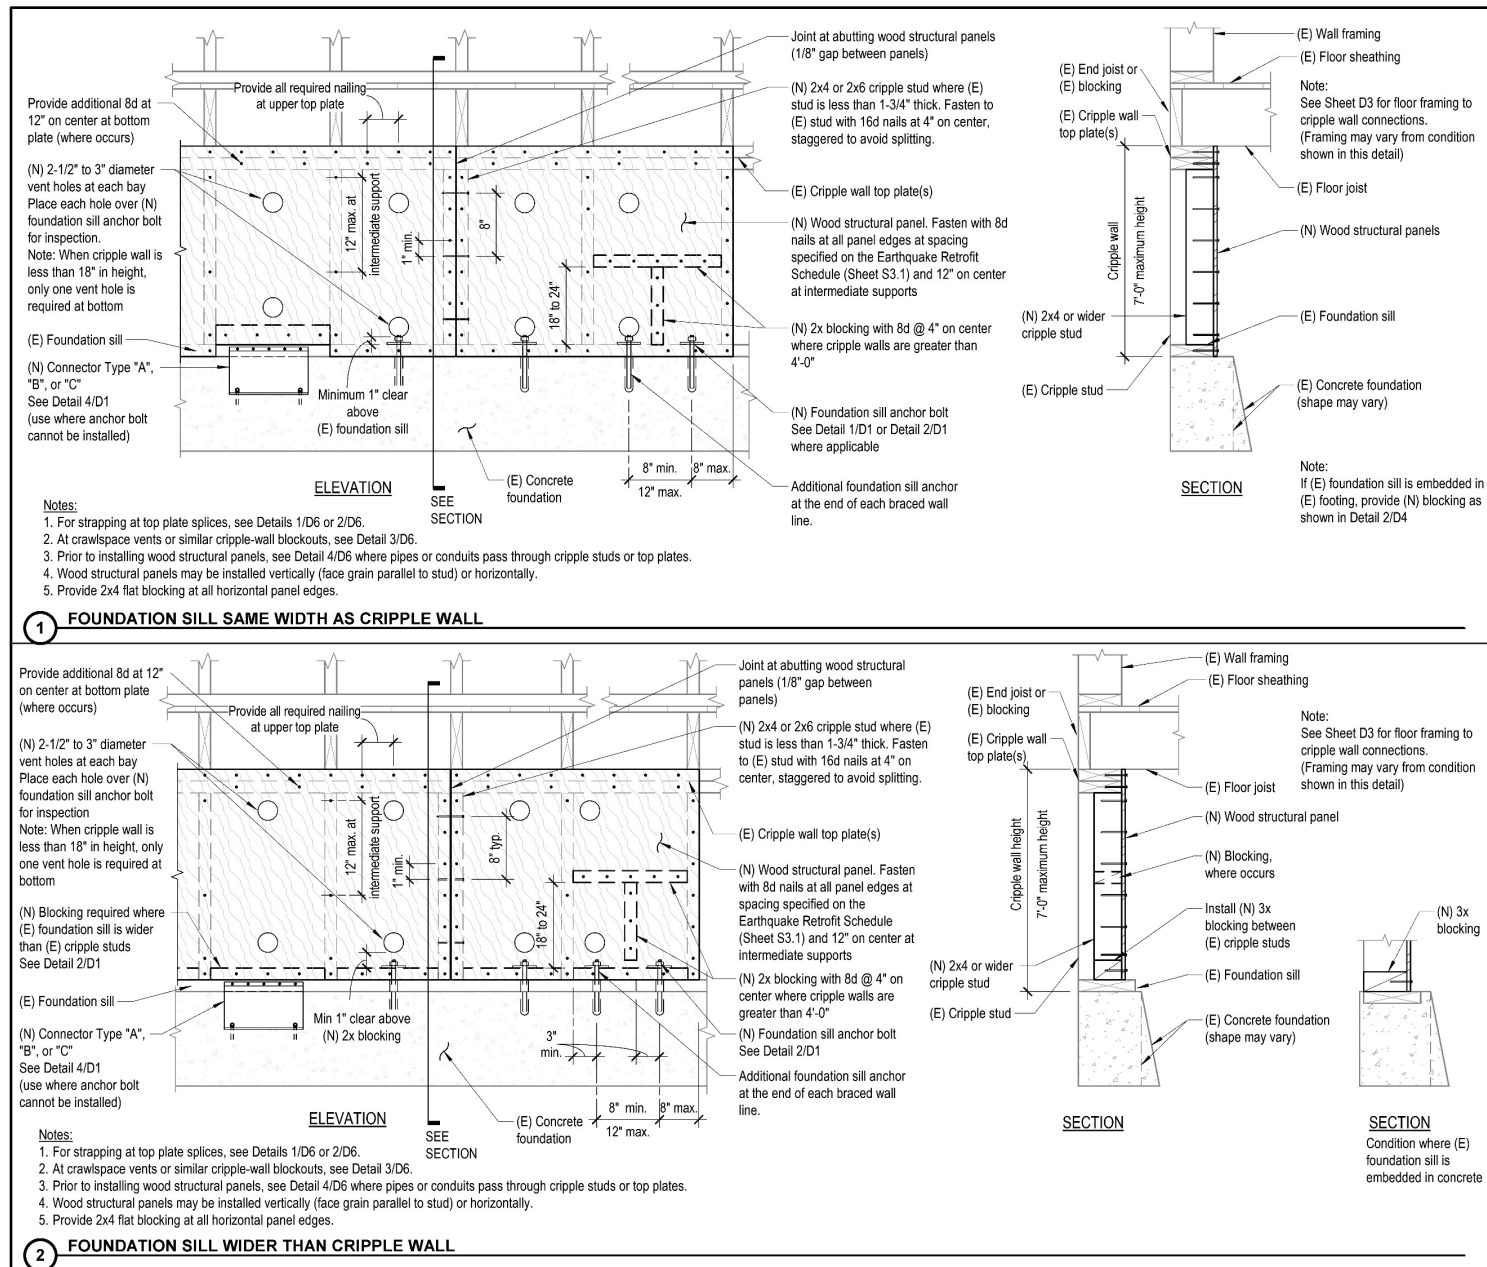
Wood structural panel installation without tie-downs. Sheet D4.
